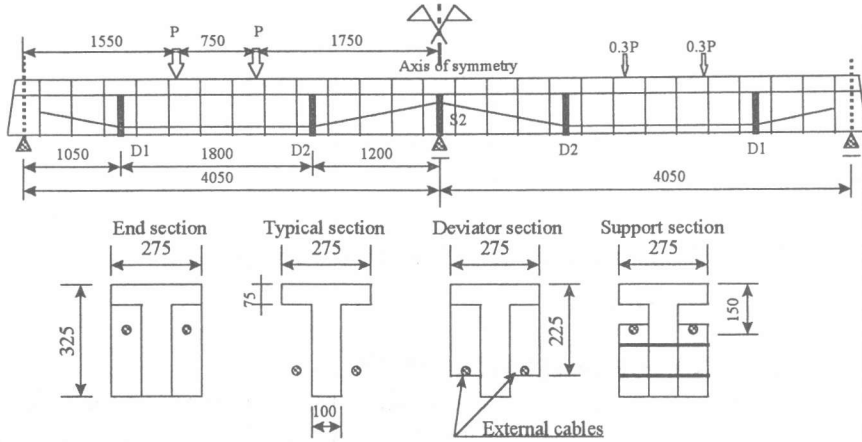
Layout scheme of two span continuous beam (Dimension in mm)
